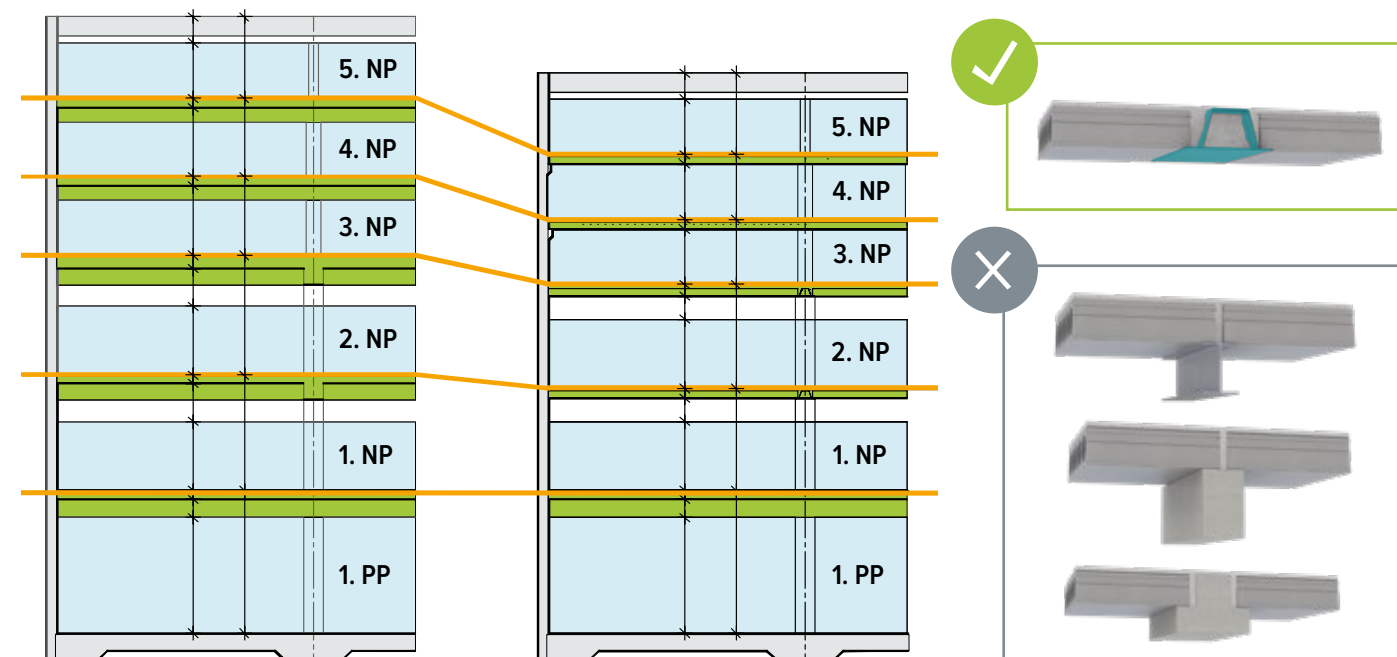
DIFFERENCE IN HEIGHT AND BUILDING ENVELOPE BETWEEN A SLIM FLOOR STRUCTURE AND CONVENTIONAL STRUCTURE
